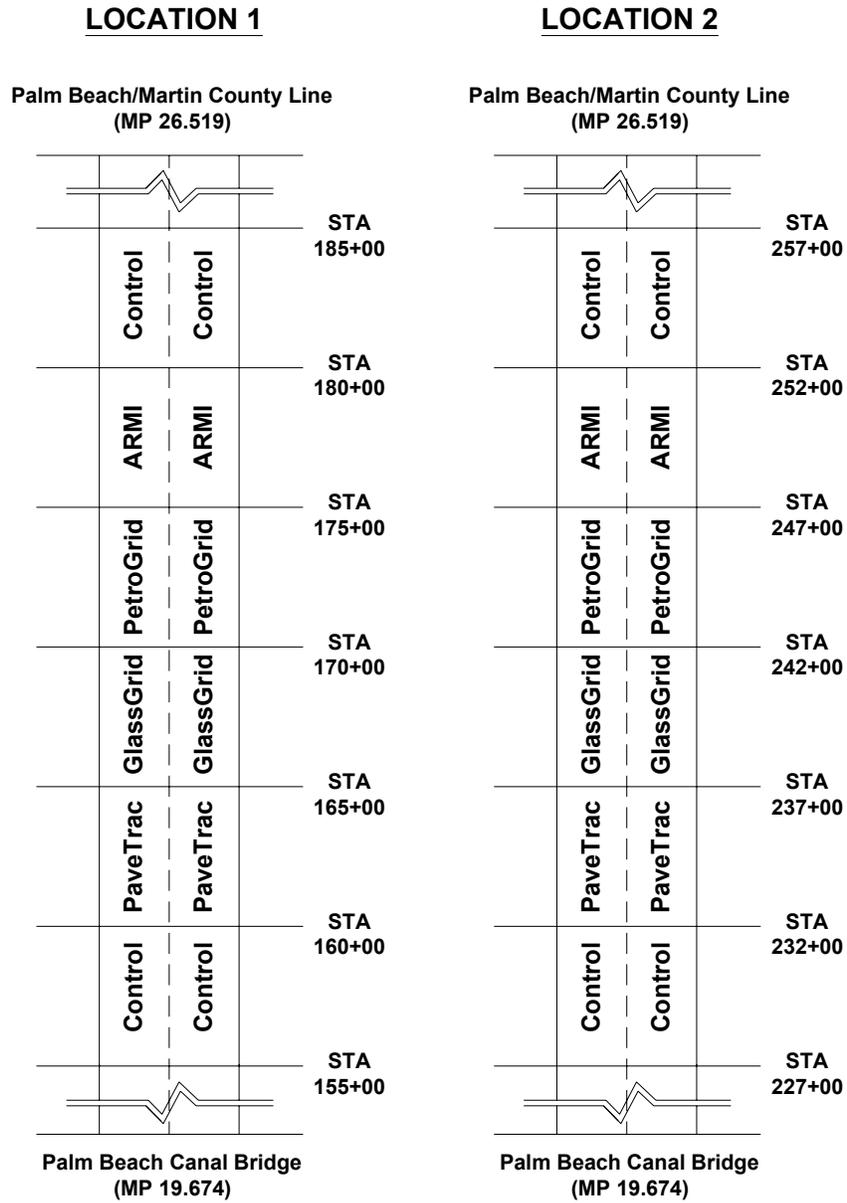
Layout of the proposed field test sections along SR15 / US98
